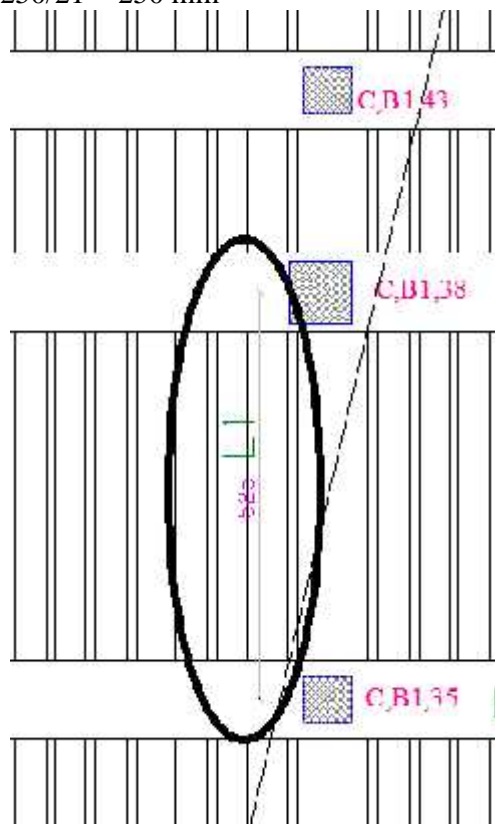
One Way Rib slab-interior span (R11-part A)
